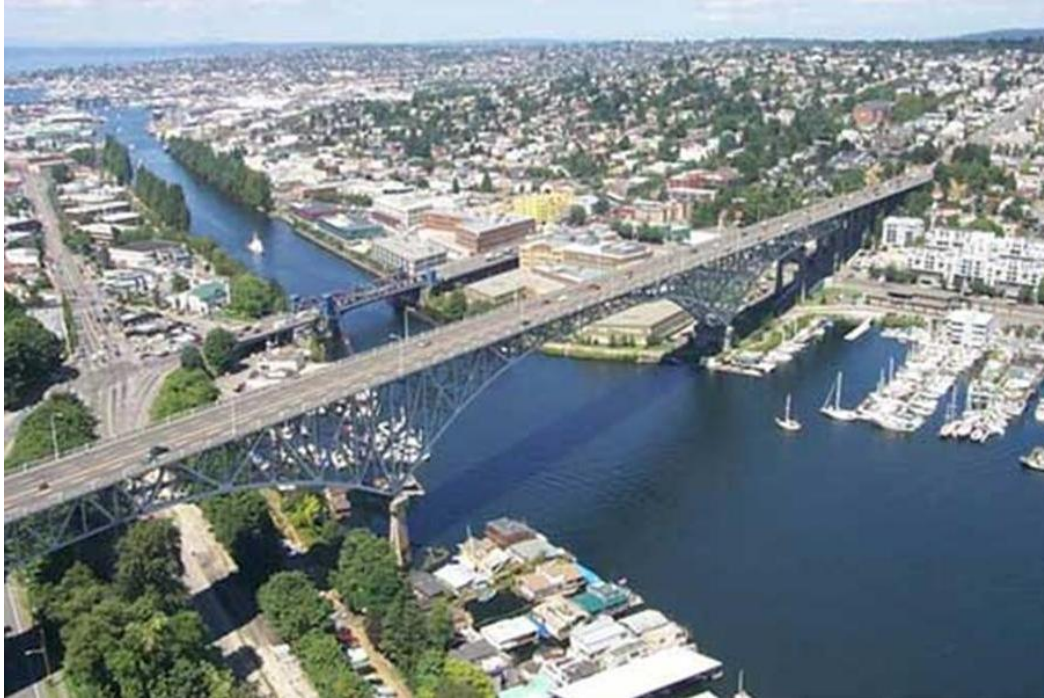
Overall Layout of the Aurora Avenue Bridge
